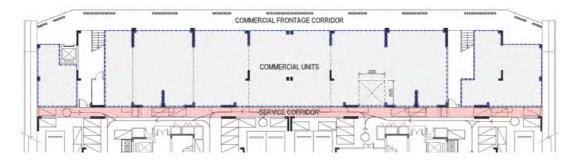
Typical commercial floor plan with 1200mm wide service corridor behind. (Marked in red)
